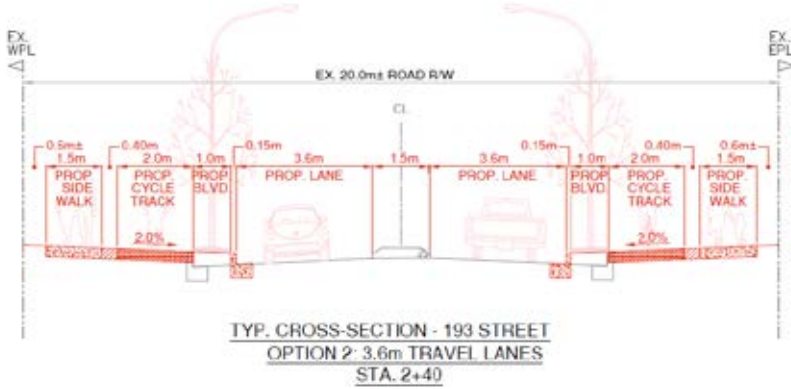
COMPLETE STREET CROSS-SECTION
